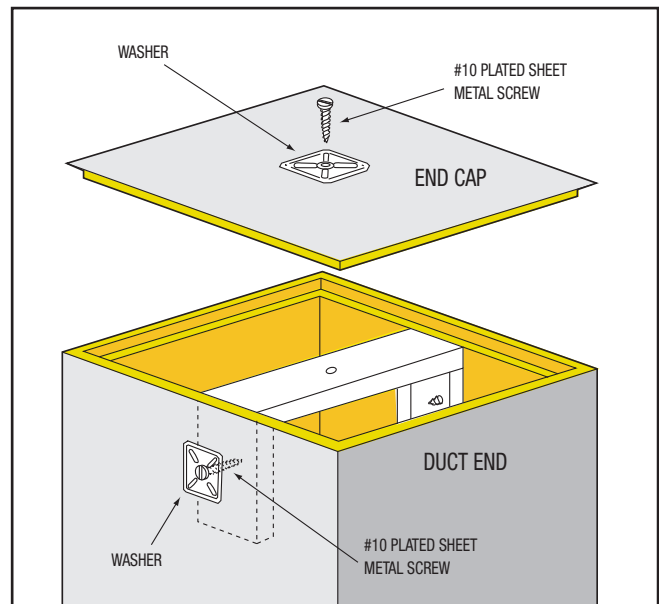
B. End Cap Channel Reinforcement Installed in Duct Section
